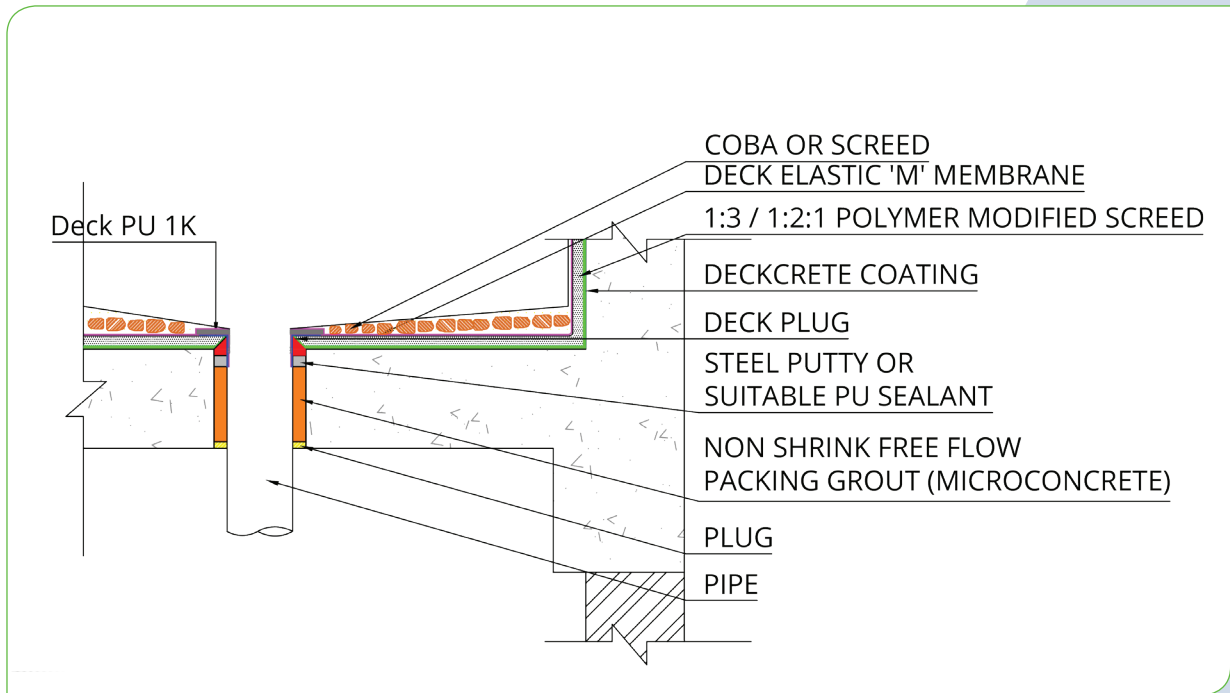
DRAIN OUTLET DETAILS THROUGH THE ROOF SLAB
